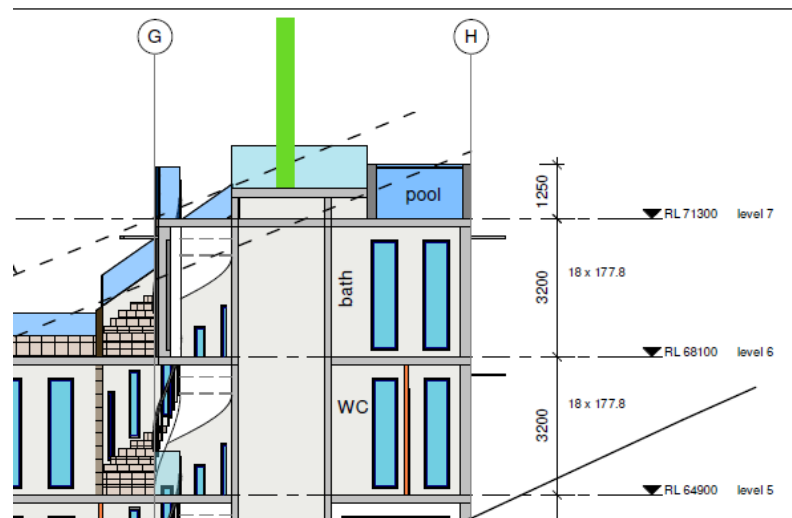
Section showing proposed tree (in green) located above all other features on the section plan
